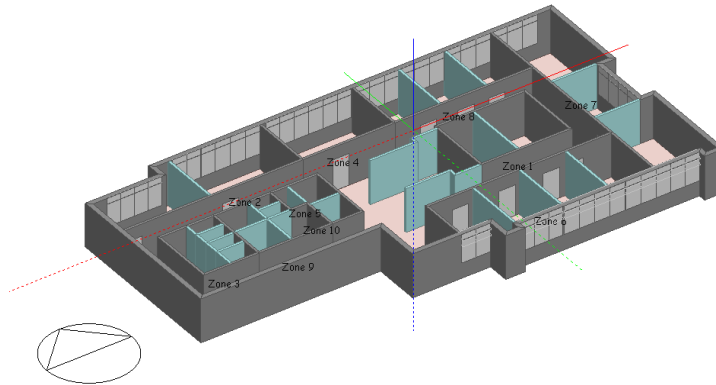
Sketch of the ground floor geometry of the case study building.
